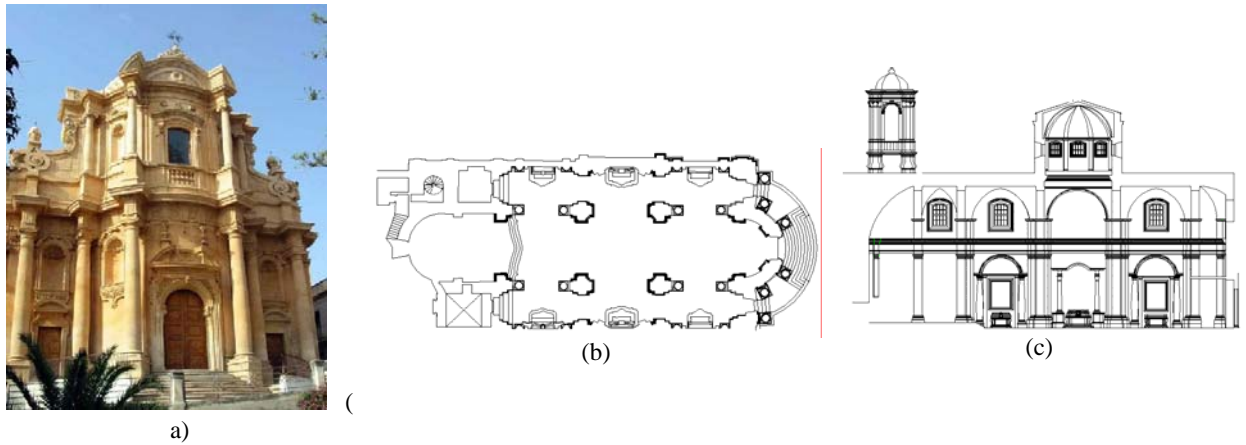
Geometry: (a) photo; (b) plan; (c) longitudinal section
